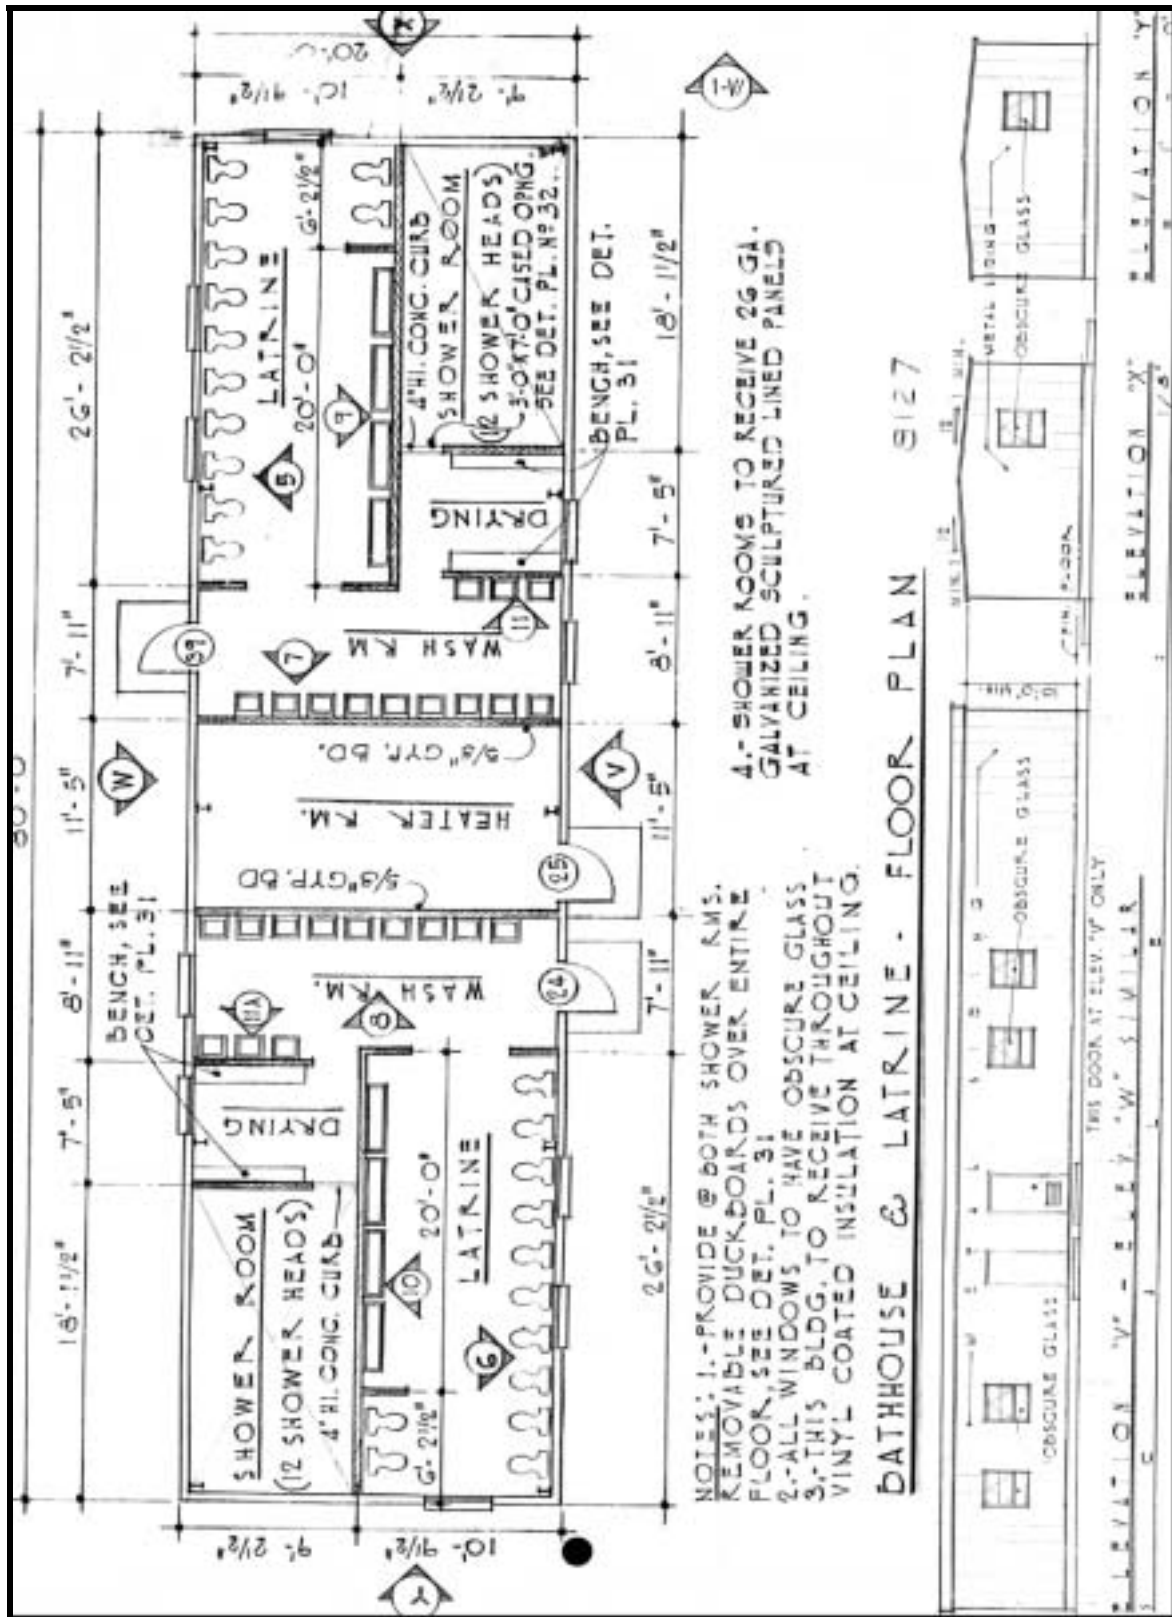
Mobilization latrine, elevations and floor plan, Dona Ana Range, Ft. Bliss (1966, revised 1967) (Engineering, Ft. Bliss).
